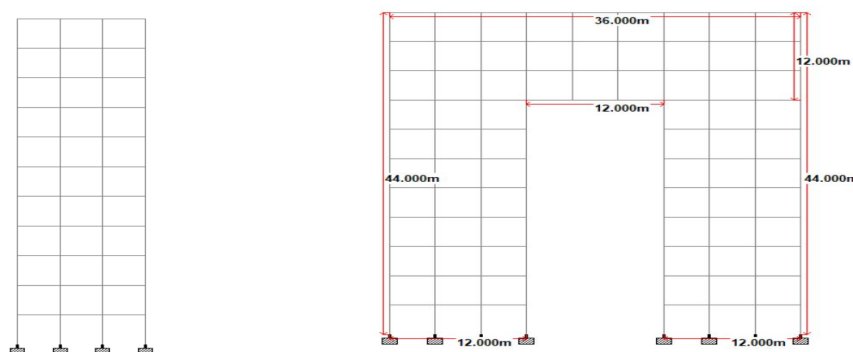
Elevation of building in X and Z direction (STADD PRO V8i.
